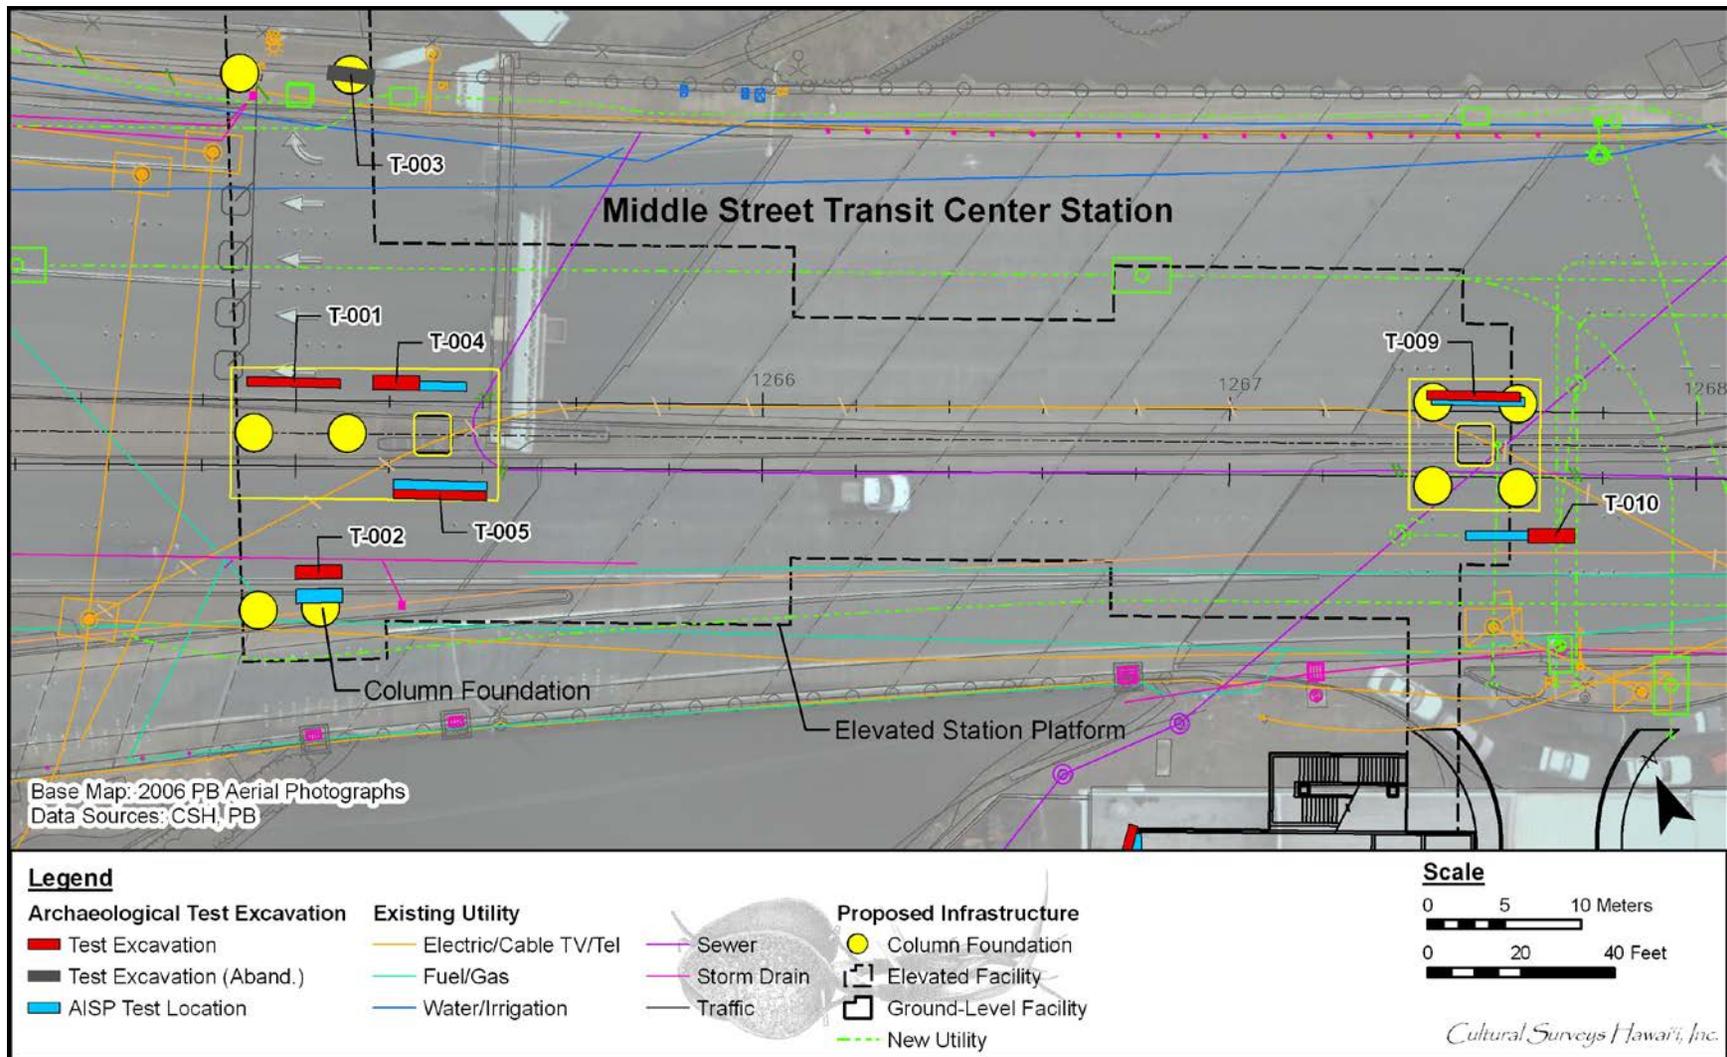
Middle Street Transit Center Station, detail of column foundation layout at Kamehameha Highway, showing locations of proposed AISP and actual AIS test excavations
